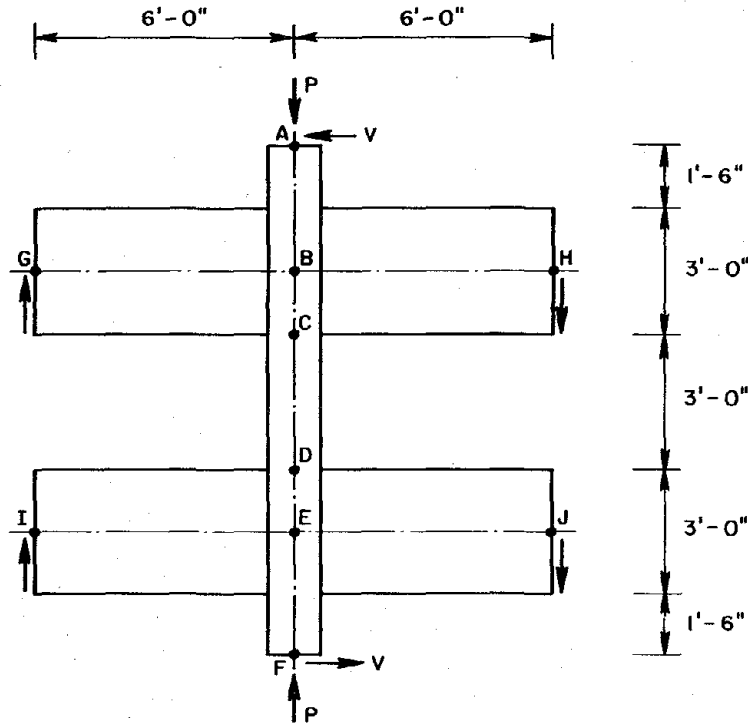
GENERAL SHAPE AND DIMENSIONS OF TEST MODEL (1 FT = 0.305 M, 1 IN. = 25.4 MM)
